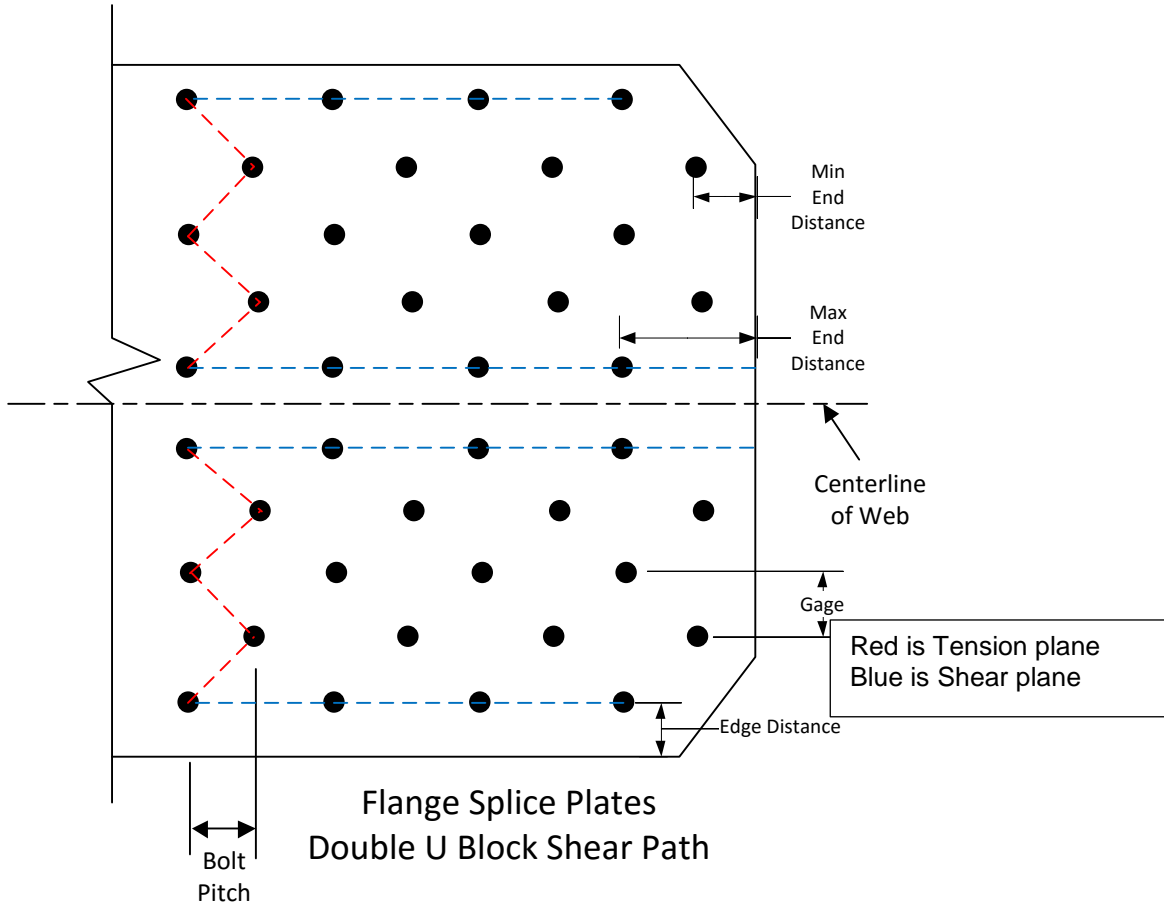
Flange Splice Plates – U-U Staggered Tension Failure Path– Condition #1
